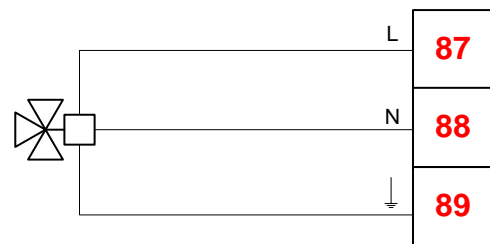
Connection diagram of the 3-way valve used with independent tanks for heating and cooling.
